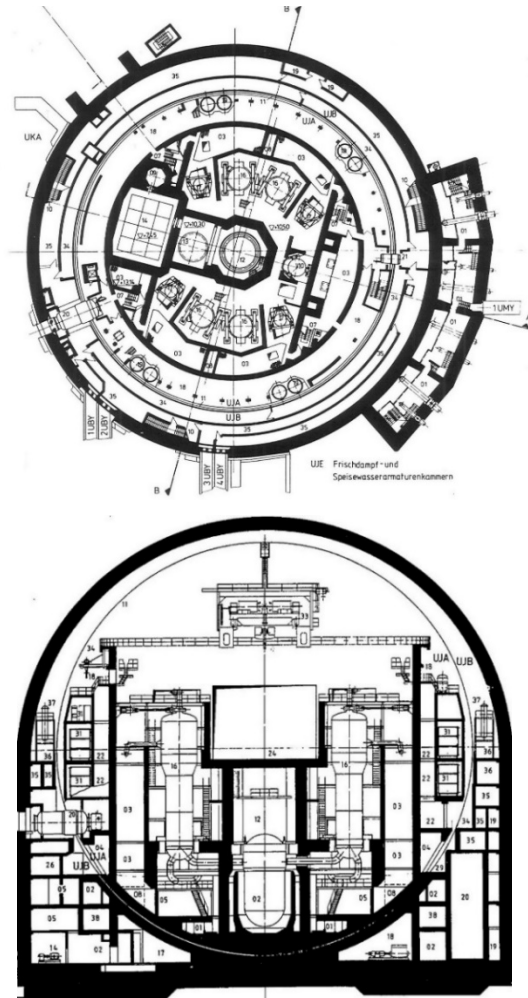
+12 m elevation cut (up) and sectional cut (down) from the public layouts of the PWR-KWU containment. Ref: [4]
